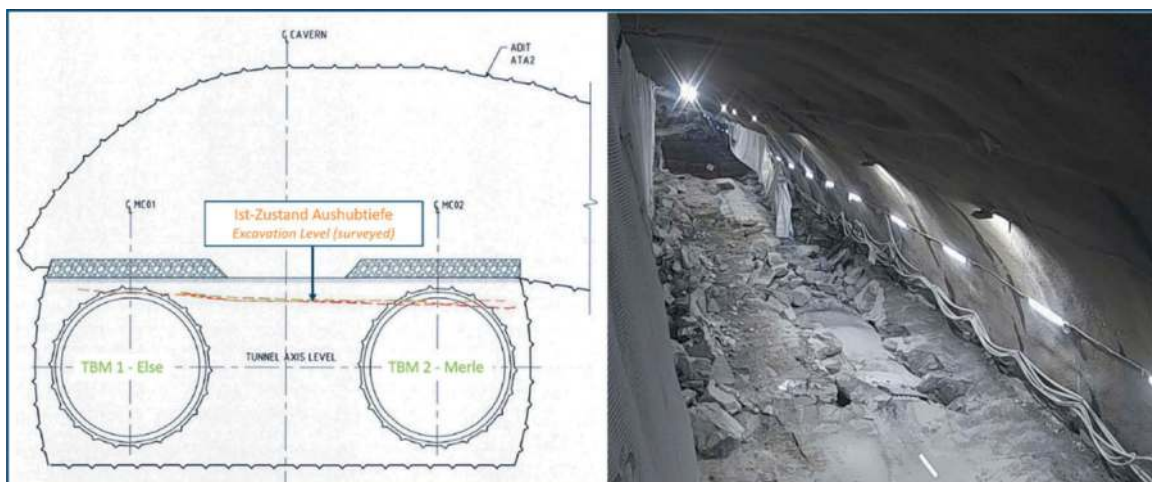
Cavern excavation level. Break-up of cover in Albert Street cavern during TBM excavation.
